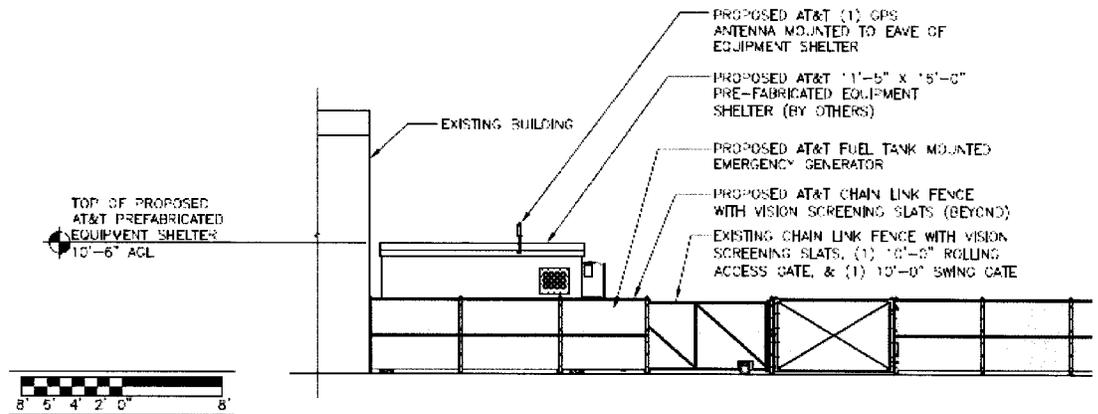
Current project plan detail (Source: AT&T; scale incorporated by J. Kramer)
